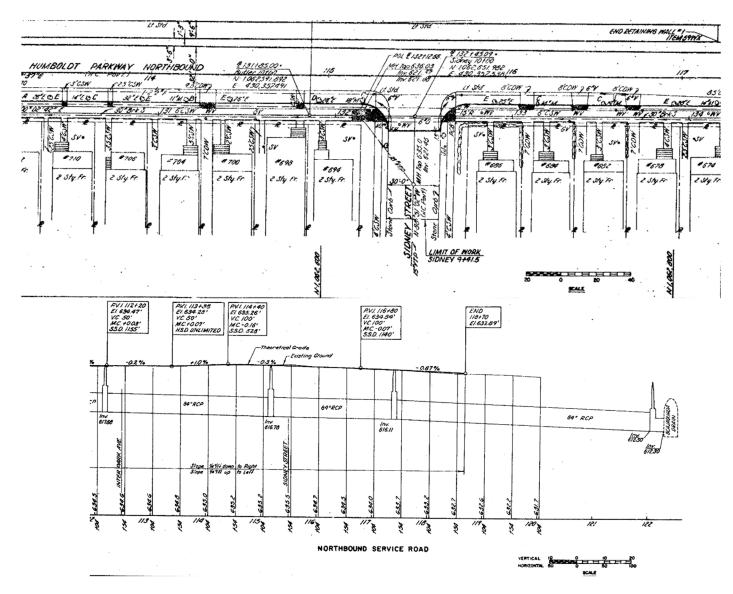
Existing Humboldt Pkwy Sewer Plan and Profile
